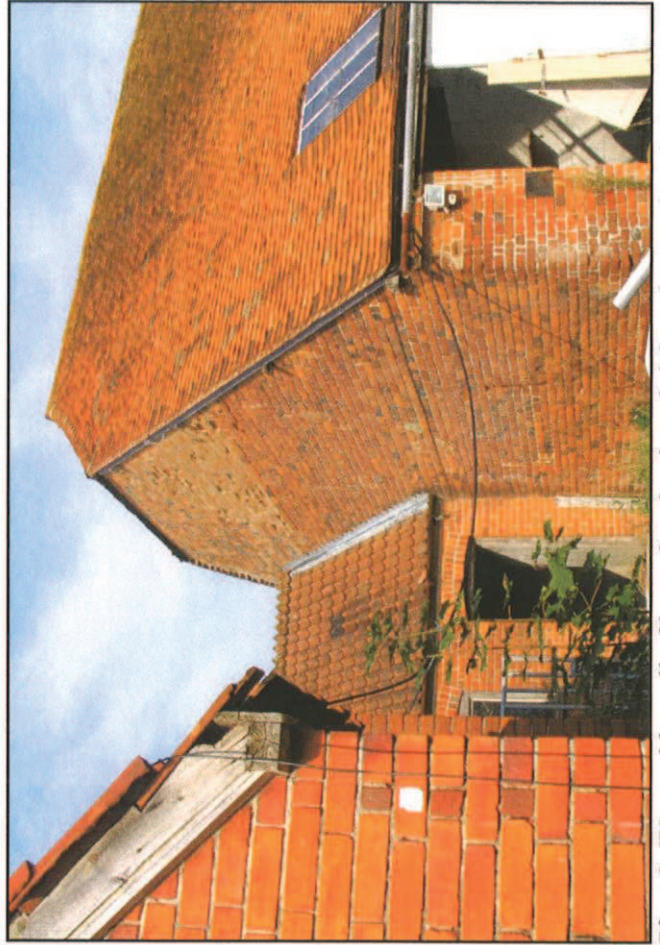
West gable wall of barn showing later brickwork covering timber-framed section, looking north-east
